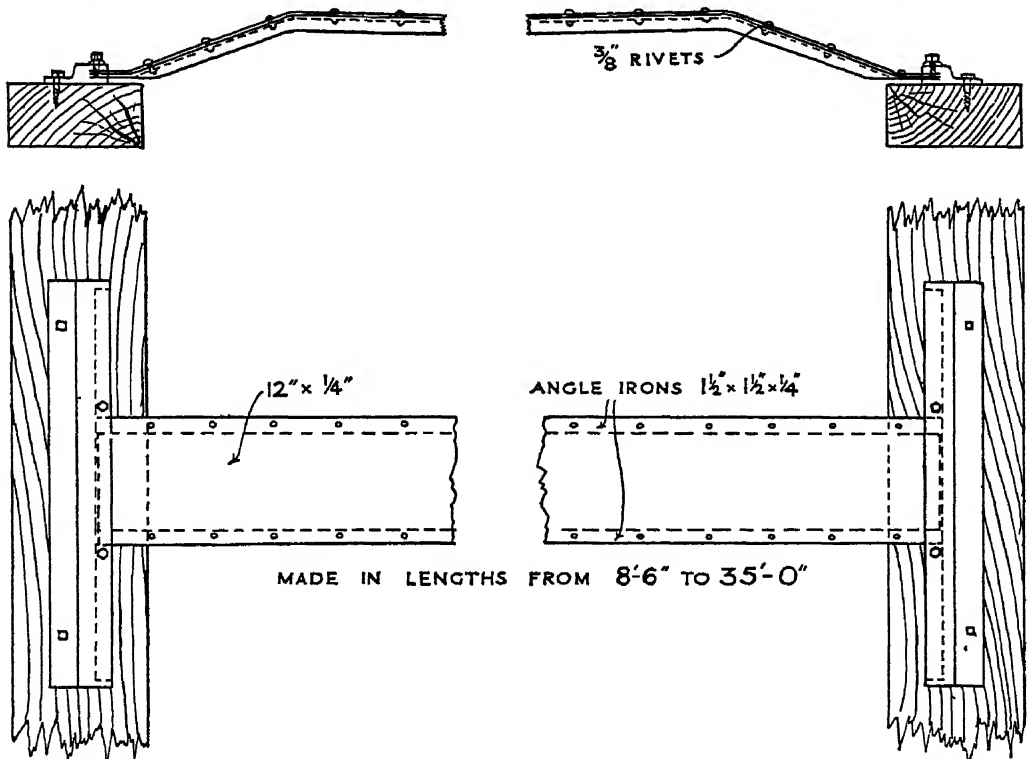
Cover for Facing-point Lock, late Taff Vale Railway, now Great Western Railway
